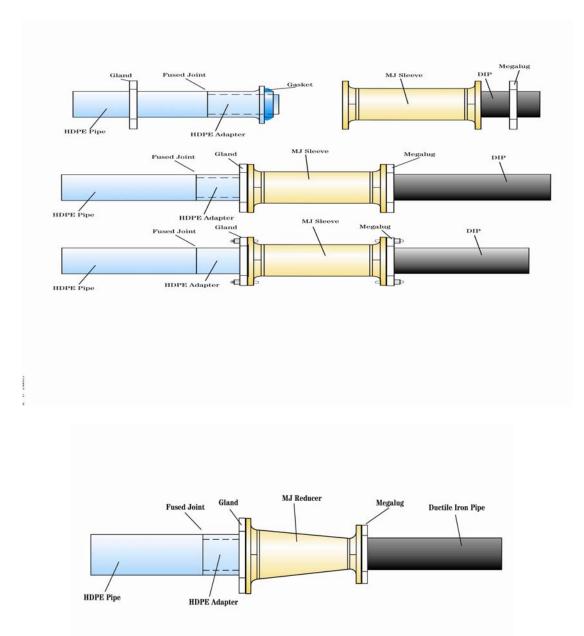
Solid DI Sleeve Connections to HDPE pipe Another solid sleeve design is called a "One Bolt" Solid Sleeve and can be used to connect HDPE pipe to PVC or DI pipe. This is similar to a standard HDPE mechanical connector but has a special locking ring that grips the HDPE pipe to prevent pullout. It is recommended to use a stiffener inside the HDPE pipe, especially if the DR is more than 11. This connection can be installed very quickly in the field and may also be used for repair. Consult with the sleeve manufacturer for application and restraint advice.
